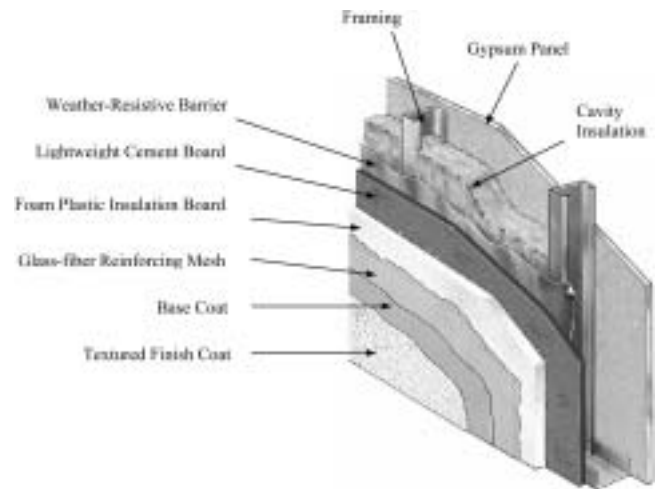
An exterior wall based on exterior insulation and finish system (EIFS) incorporating lightweight cement board as a substrate panel.
